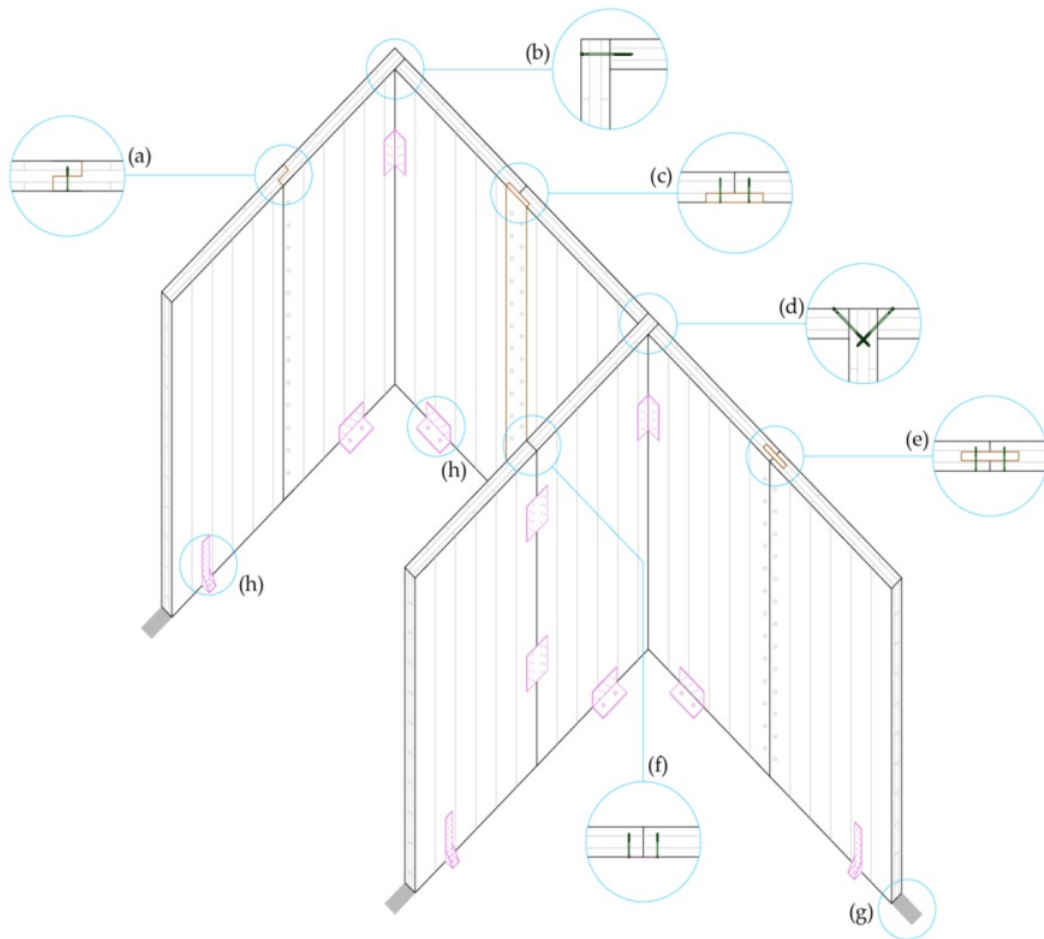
Typical connectors used with CLT panels. (a) coupled wall with lap joint; (b) 90° corner joint; (c) coupled wall with external spline joint; (d) wall intersection/T-shaped joint; (e) coupled wall with internal spline joint; (f) single wall joined with steel plates; (g) decoupling strip; (h) fasteners - hold-downs and angle brackets. (DI BELLA; MITROVIC, 2020)
